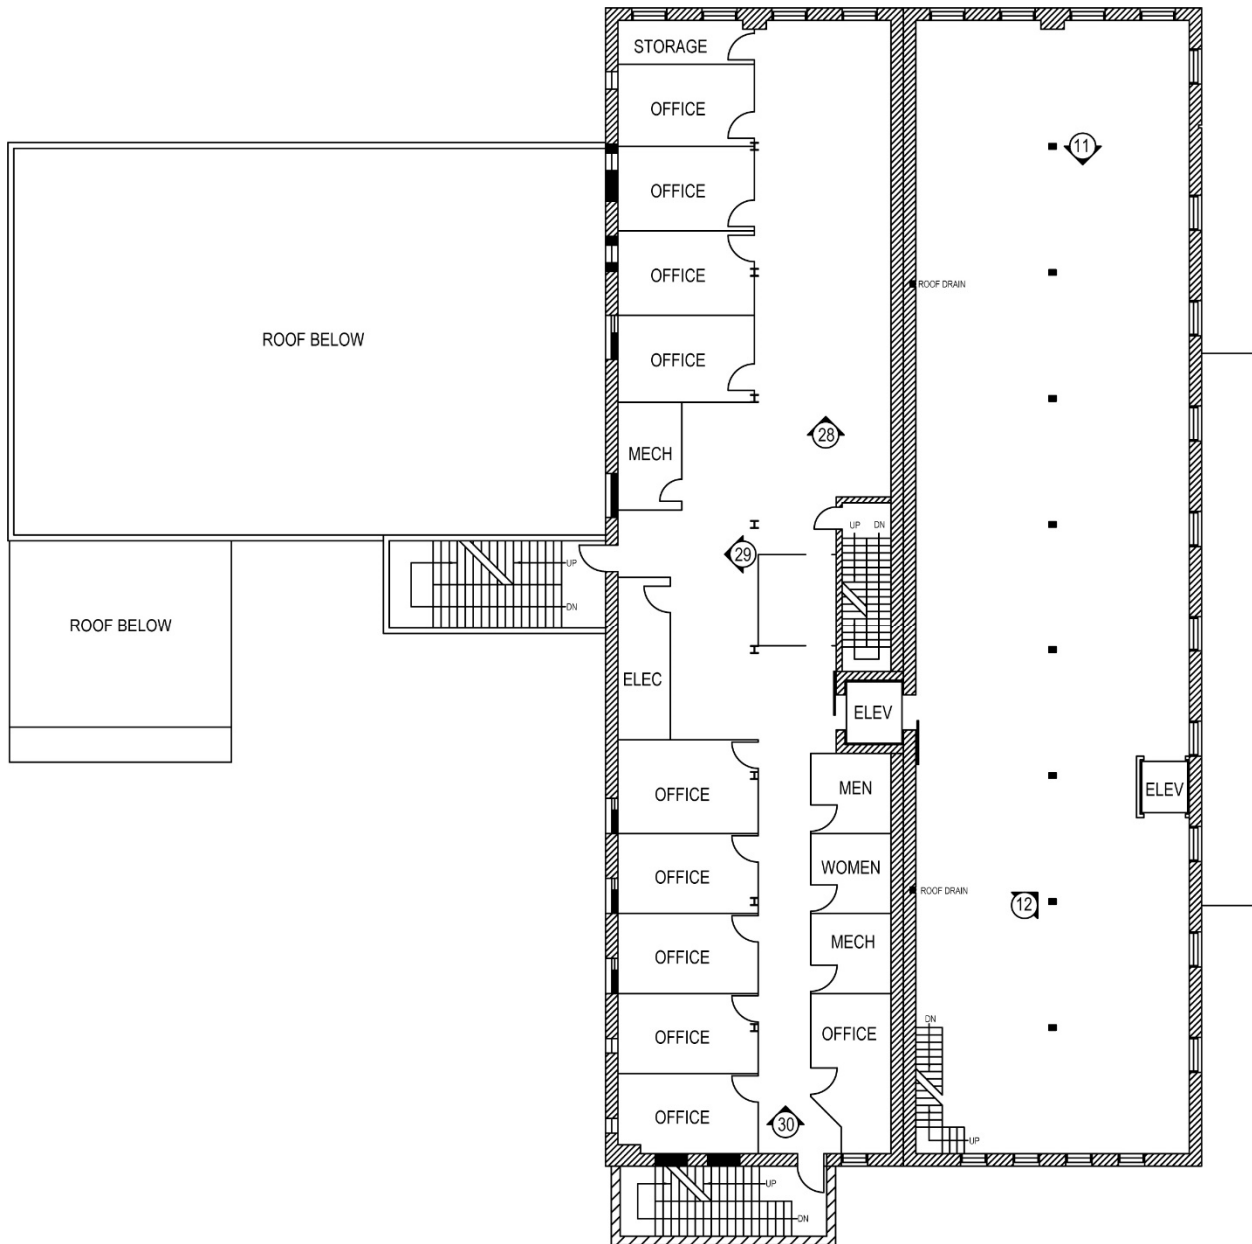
Third Floor Plan with Photo Locations (not to scale)
